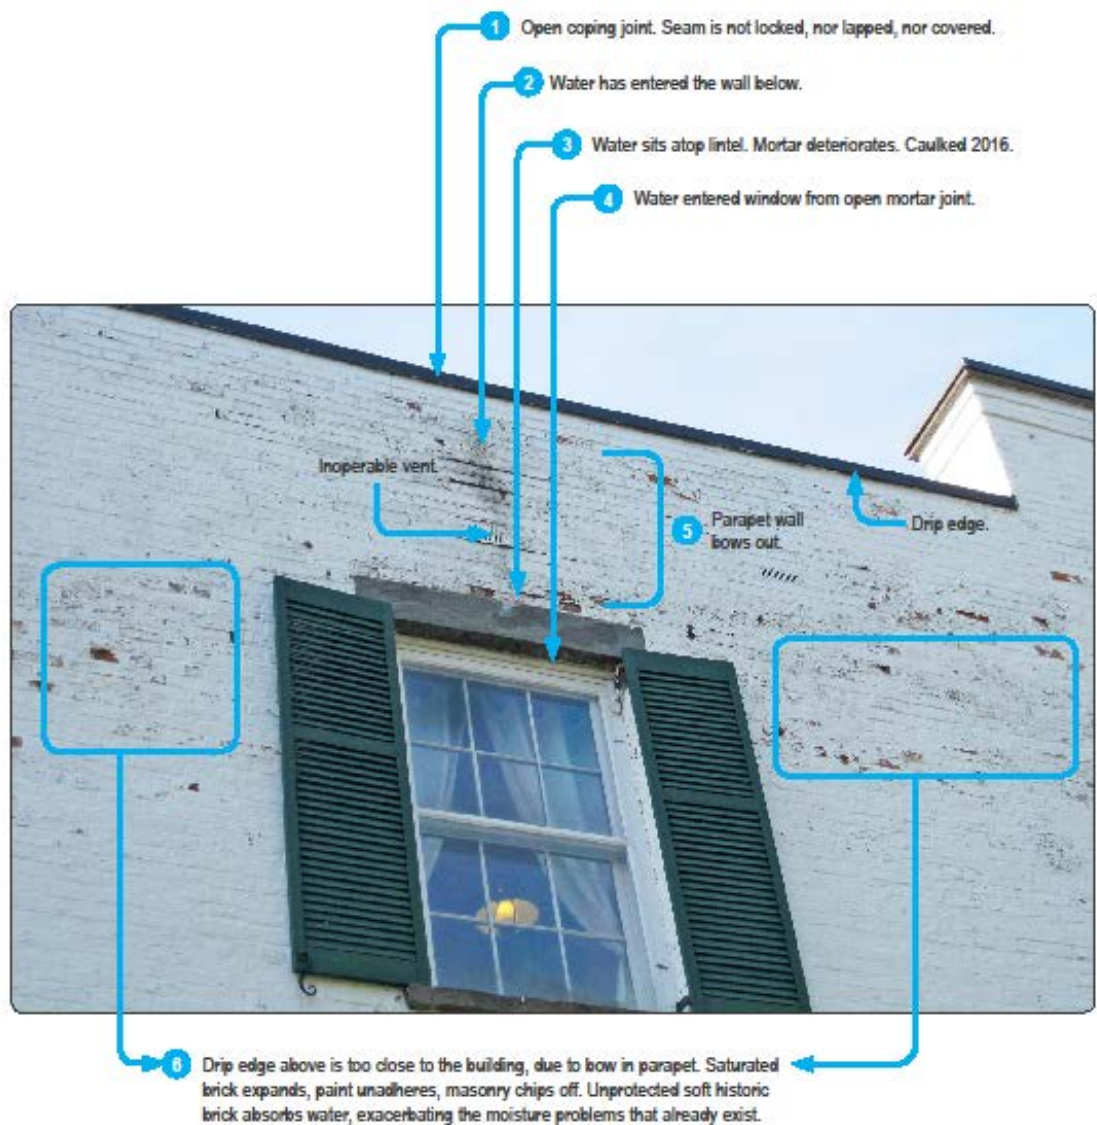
Illustration of water related problems at second floor parapet, north elevation.
